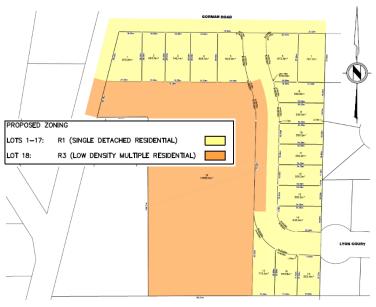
Proposed Zoning & Preliminary Subdivision Layout
